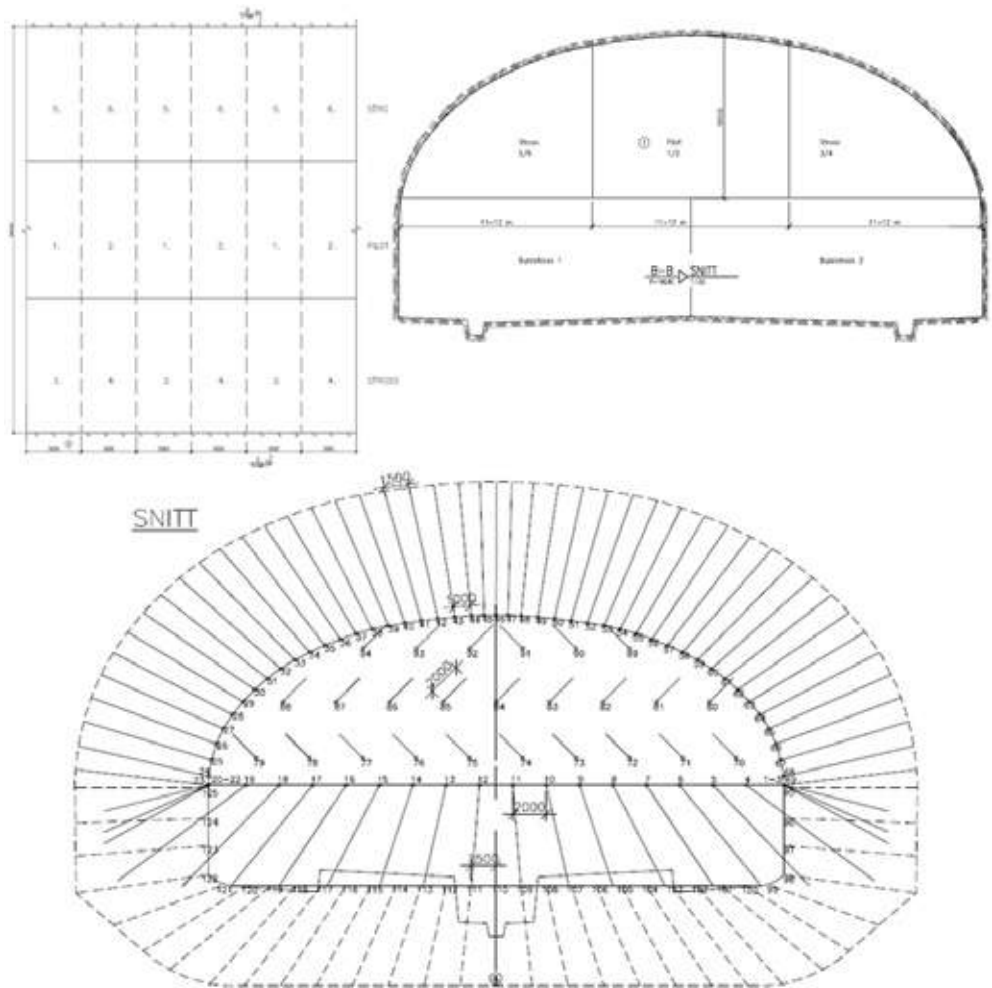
Excavation and grouting in typical rock mass quality. Upper left: excavation sequences of the gallery; upper right: the whole cross section is divided in five excavation sequences; lower: grouting holes drilled from the gallery (solid lines) and the tunnel floor (broken lines).
